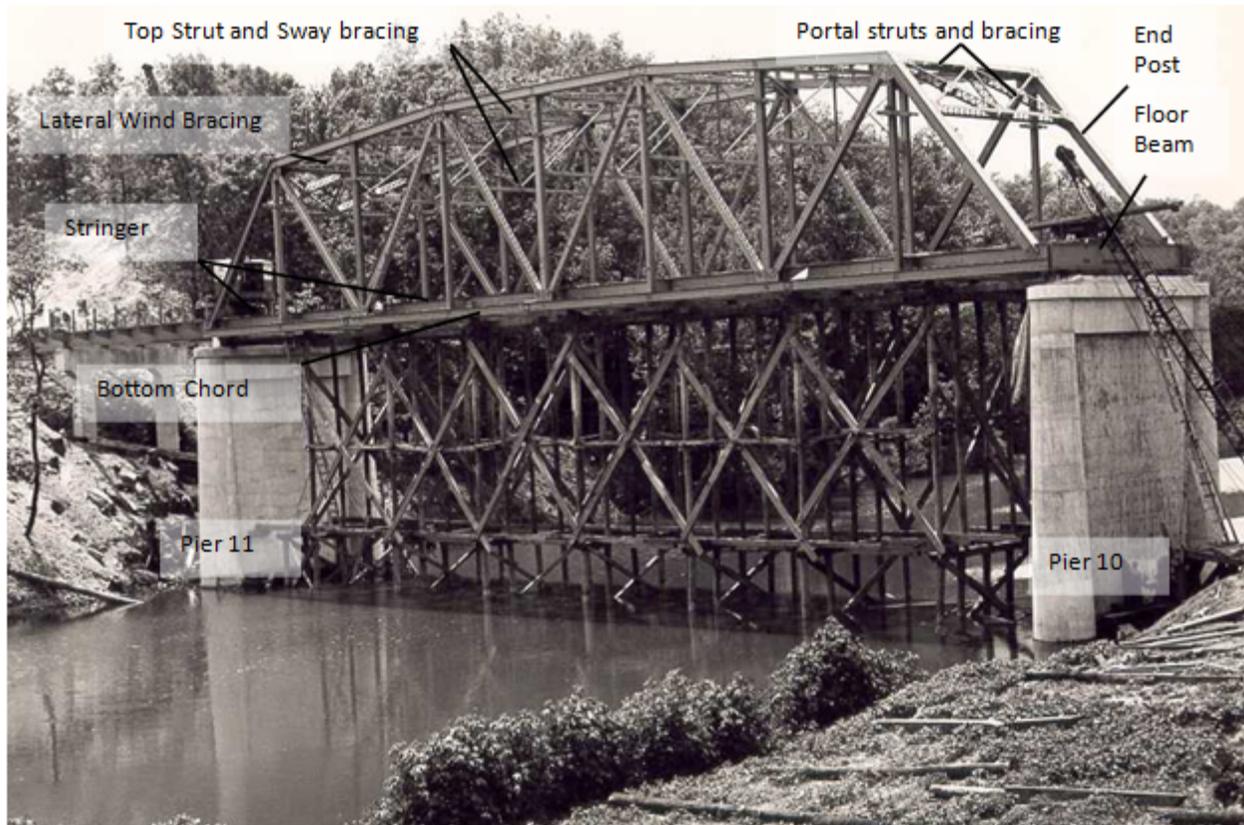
Truss span of Bridge J0021R during construction in 1941 prior to removal of the falsework
